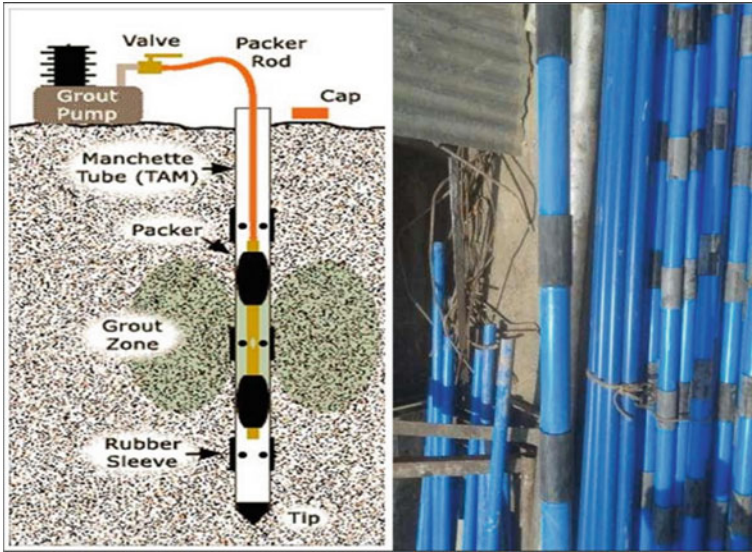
TAM grouting layout (<https://www.huininkinfrastructure.com/grouting/tam>)
